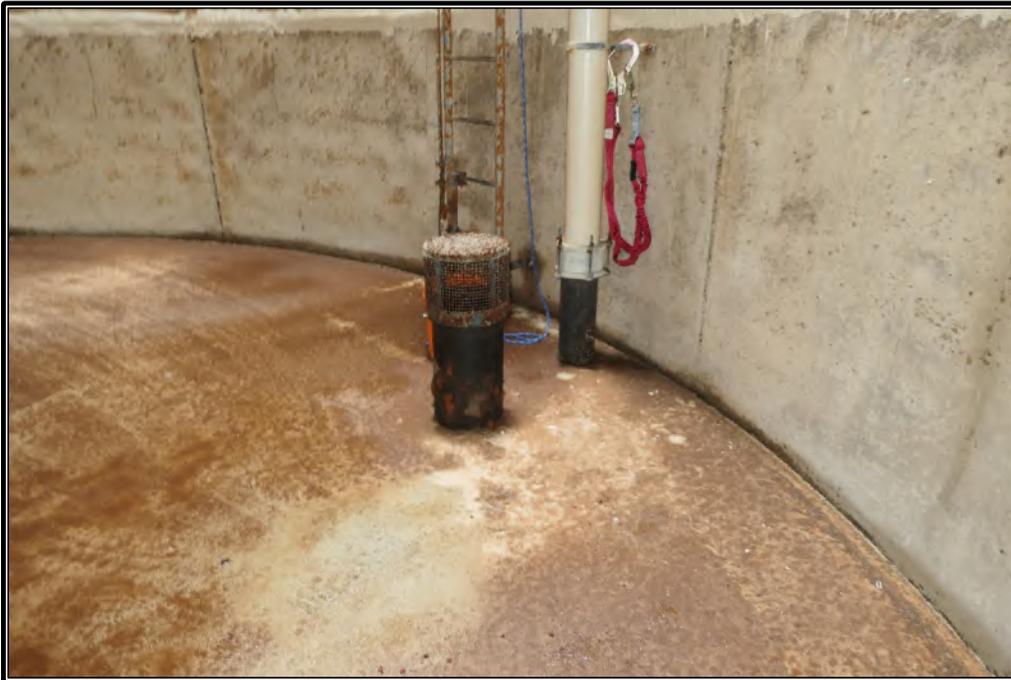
Parkhurst Reservoir – Outlet and Inlet Pipes
